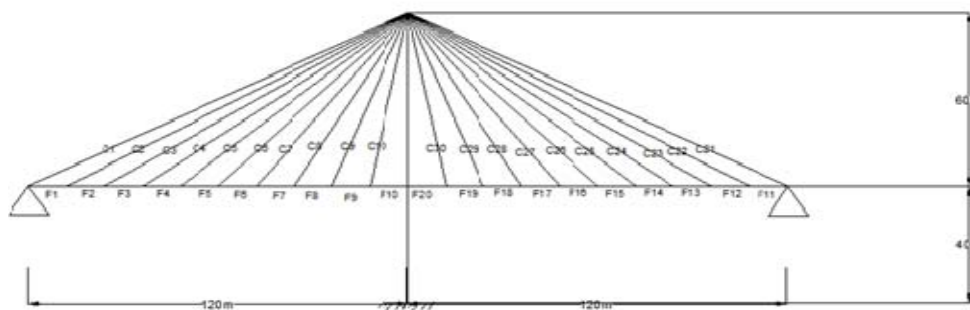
Typical Geometry of Cable-stayed Bridge
